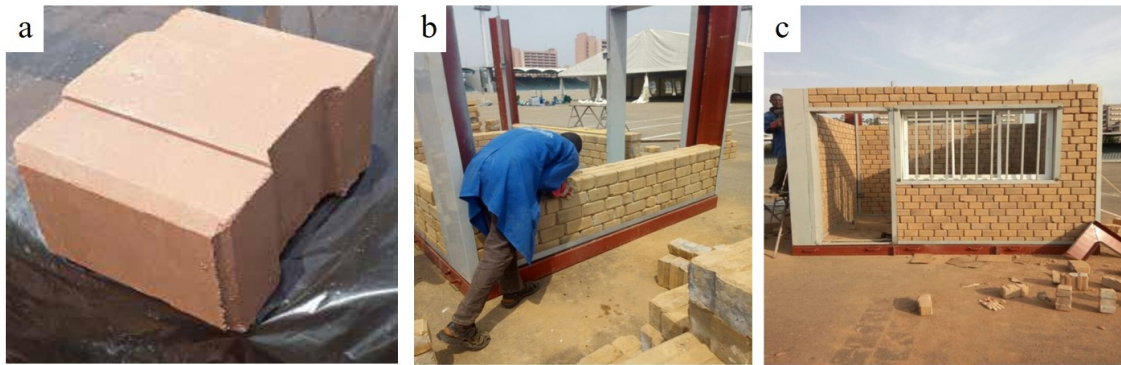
Compressed Stabilized Earth Block (a) the CSEB (b) Installation of the CSEB (c) Single Bedroom
